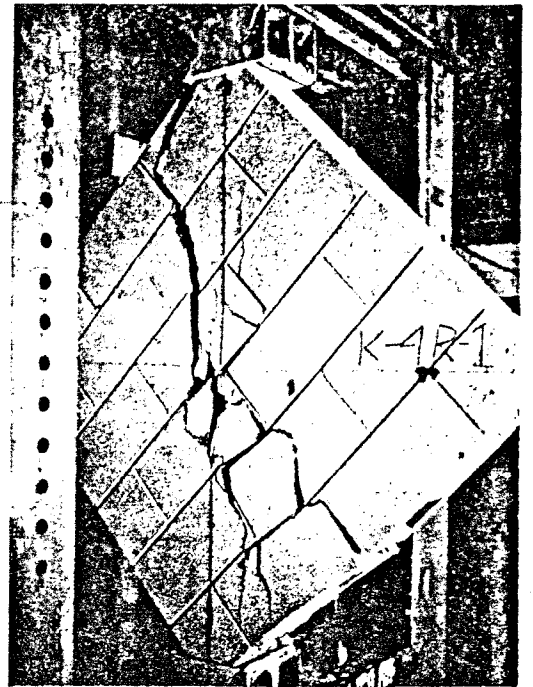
Racking Test continued beyond initial failure. Specimen conventionally constructed (without Korfil Inserts) and Reinforced with 1 #4 at 24" on Center.
